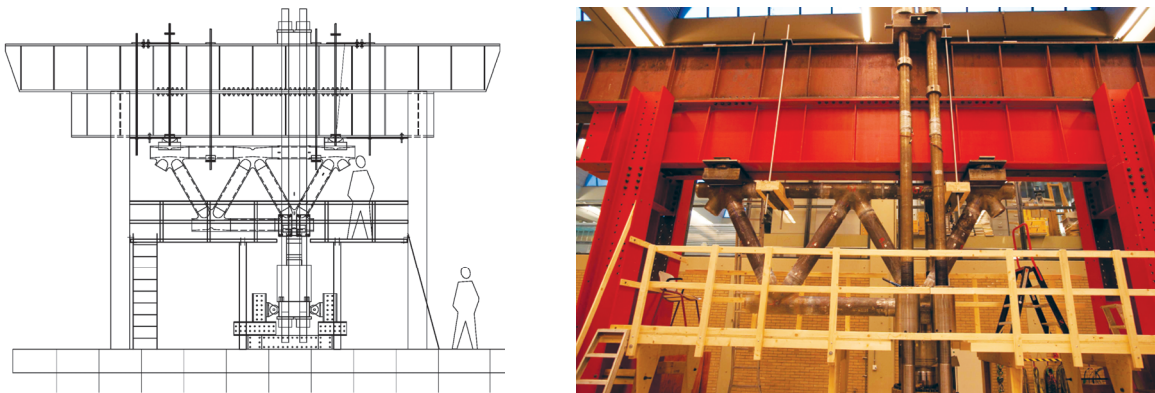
Hybrid truss girder test specimen (Drawing and photo courtesy of Professor Frans Bijlaard).
